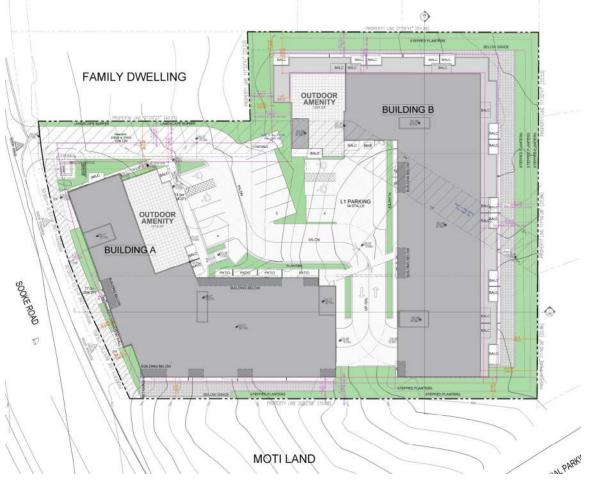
WA Architects plan detail; residential buildings A, B and surrounding features.
